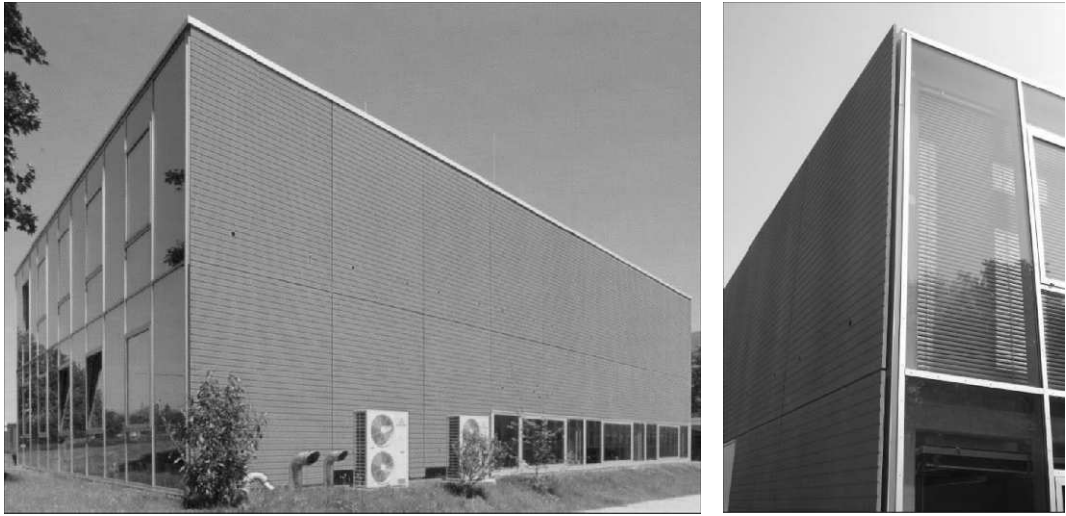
Laboratory building of IMB-RWTH Aachen University, panels produced by Hering Bau GmbH (source: Institute for structural concrete of RWTH Aachen University)
